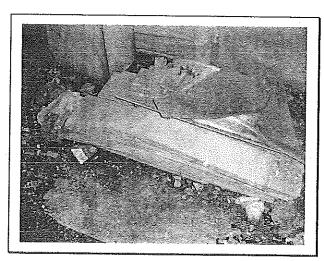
ACM	Viewing transite panels, 1 st floor North entrance.
